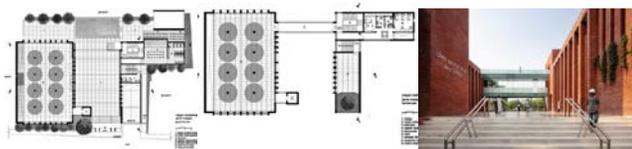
Ground Floor Plan , First Floor Plan of Mayor Mohammad Hanif Jame Mosque
